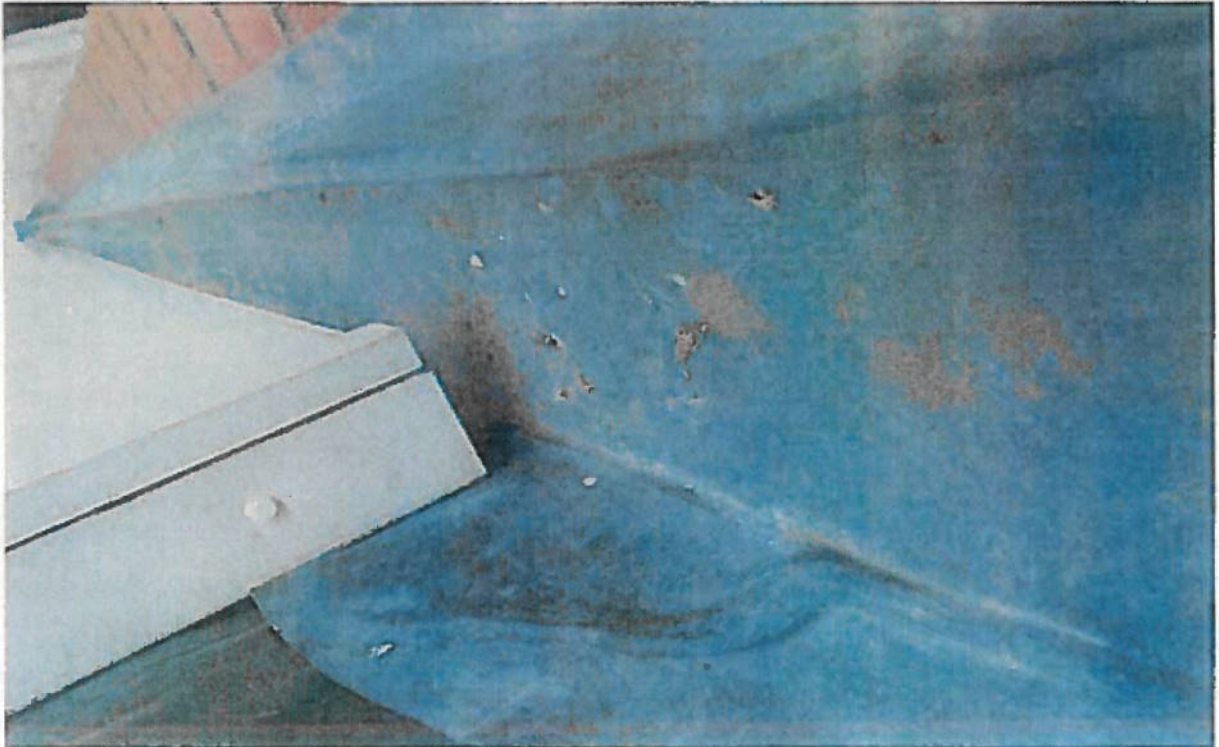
(Extension to the rear of no. 18 Riverside Grove, which has been constructed on the rear boundary / party wall between no. 17 and no. 18)
